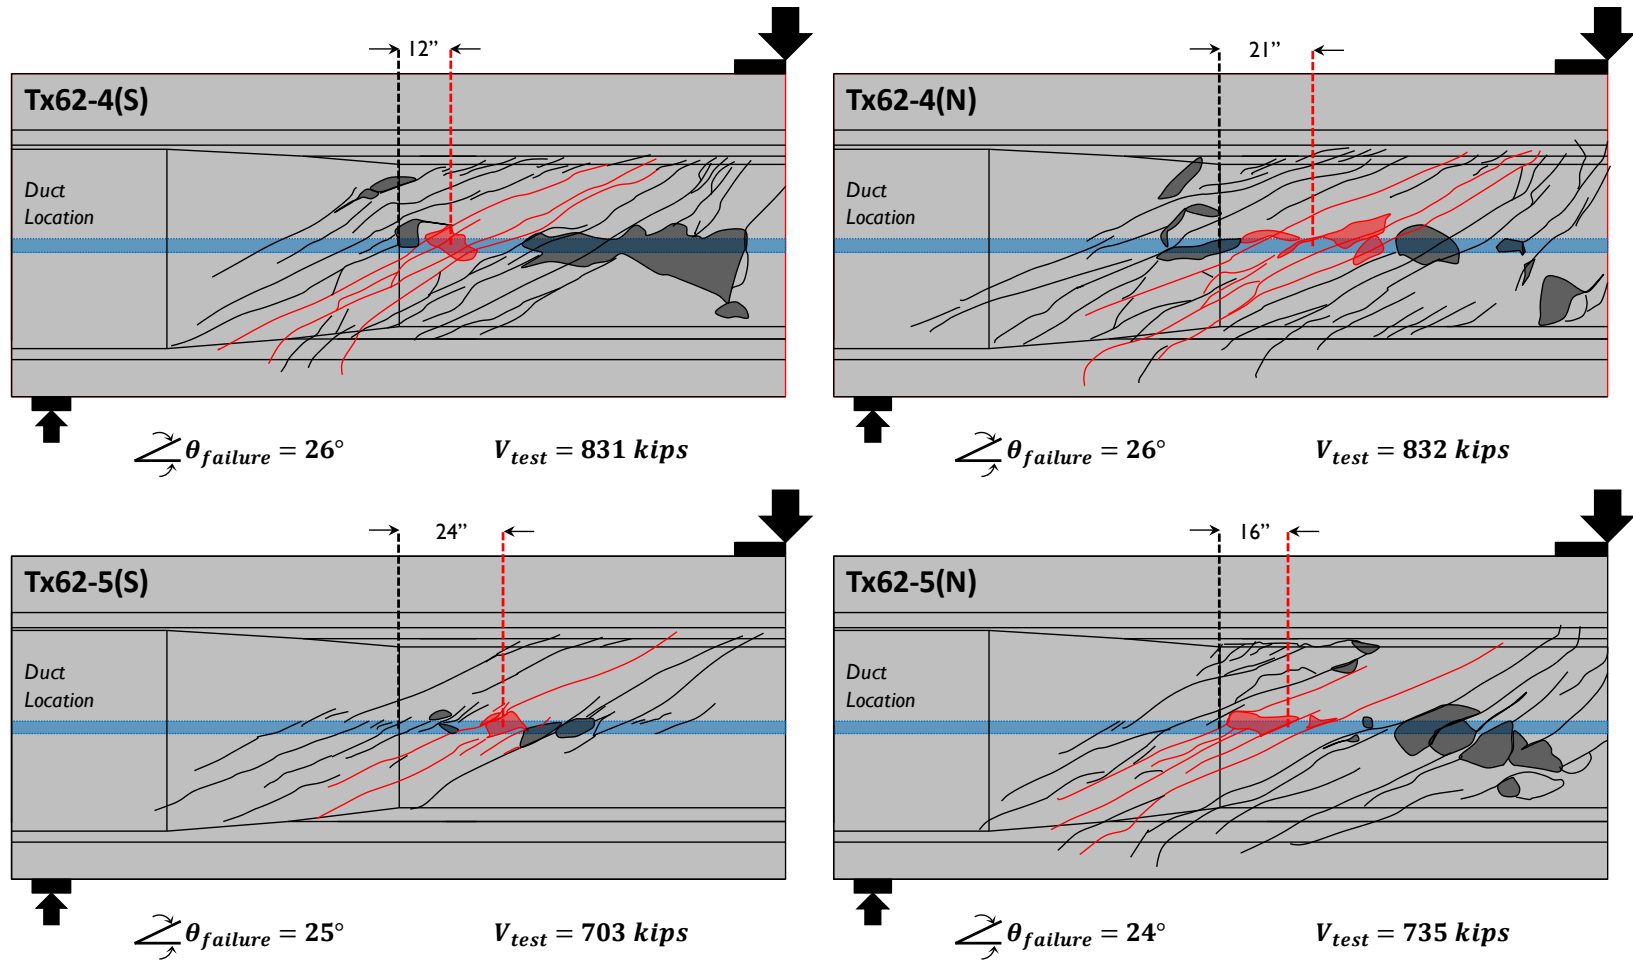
Failure Mechanisms of Test Specimens Primary Failure Cracks in Red (Part 2 of 3)
